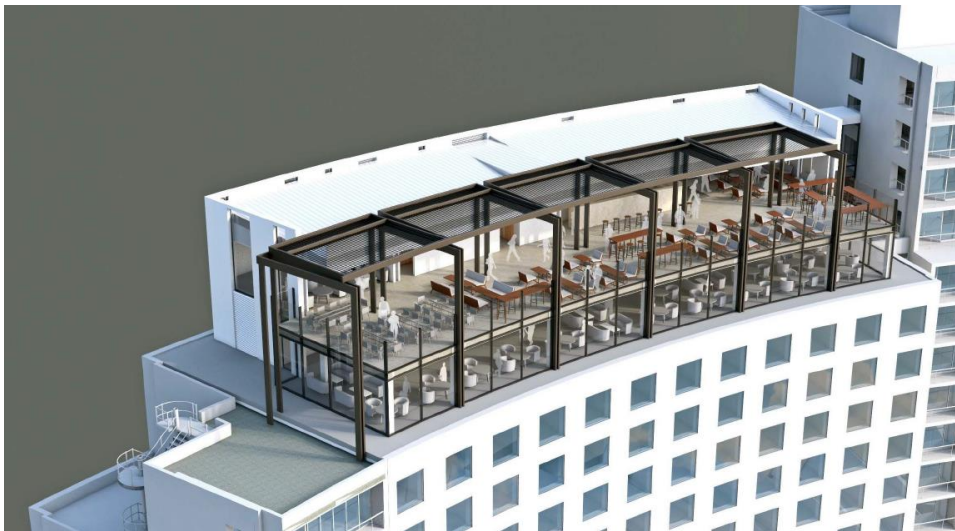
Photomontage of the proposed new executive bar and lounge.
